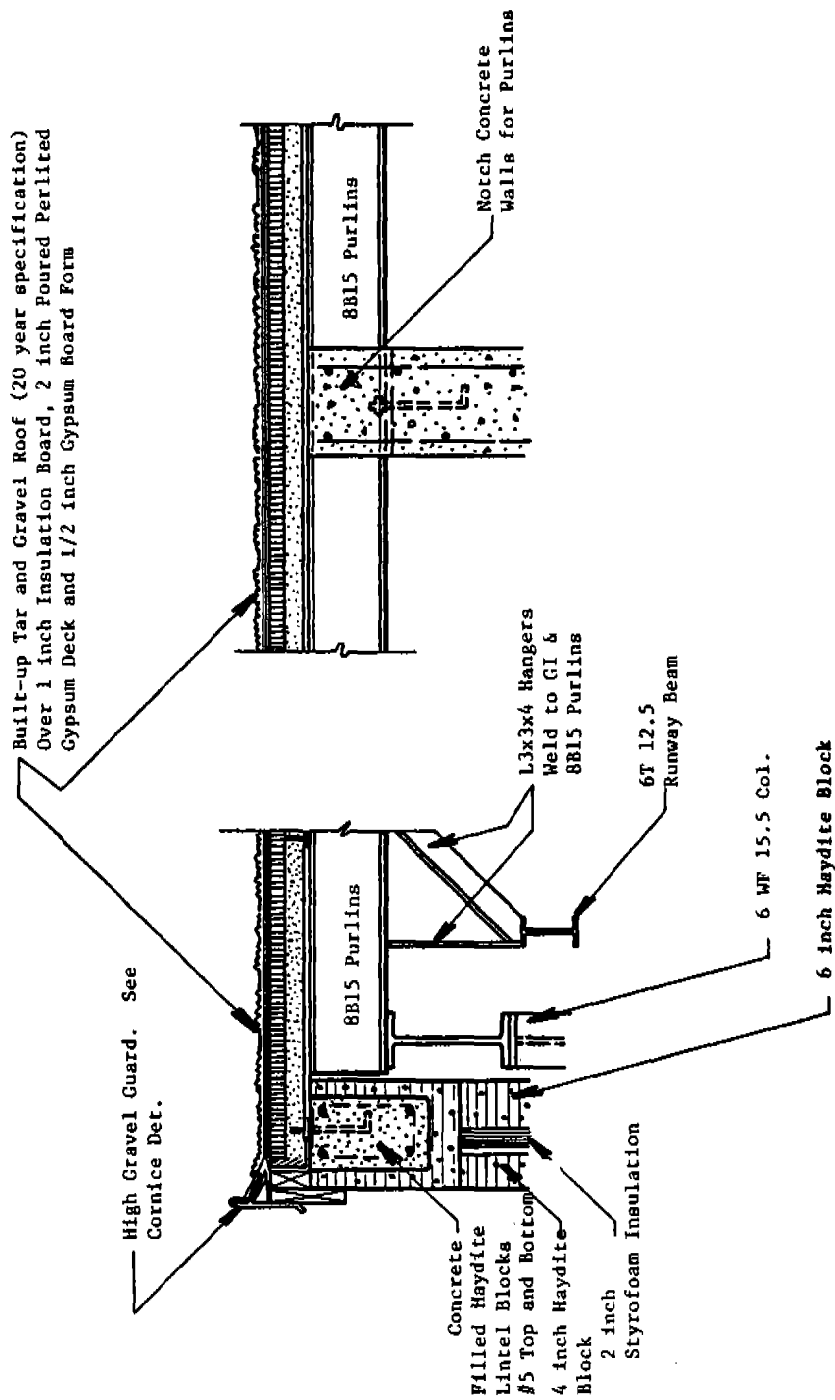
Detail for Venting Roof Design (Building 11-14)
